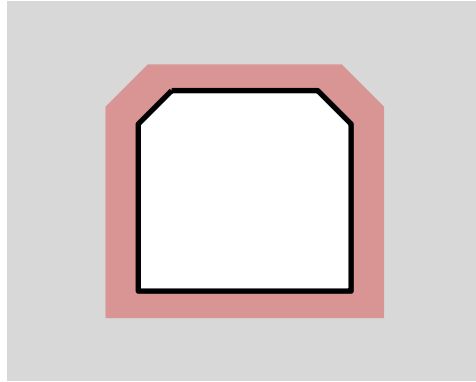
Example of how to introduce an excavation damage zone around a tunnel.
